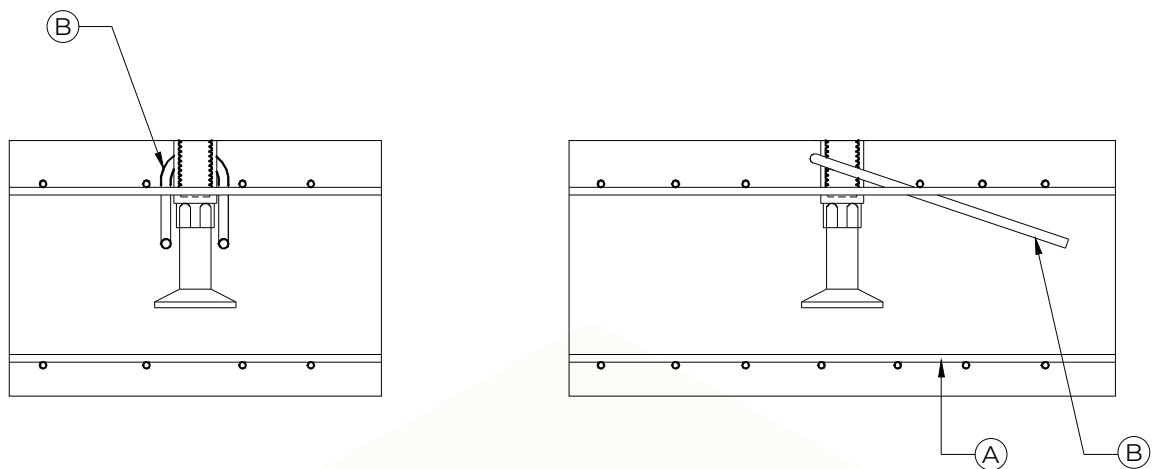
Reinforcement for ECP lifting anchor in slab :-
